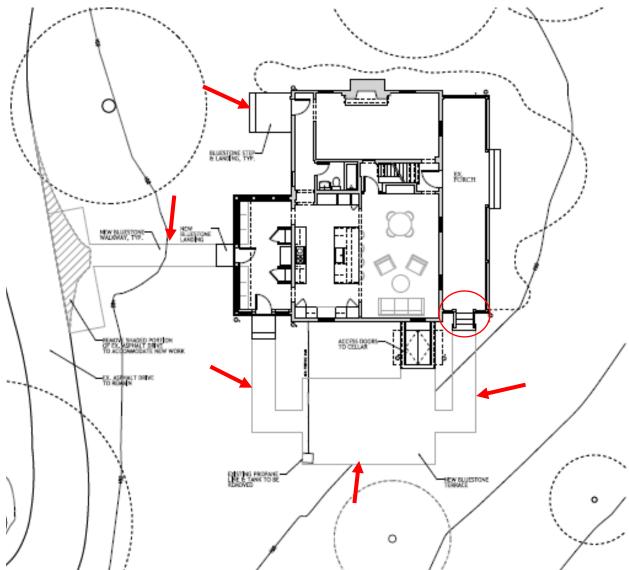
Revised site plan with red arrows showing the proposed bluestone walkways and terrace south of the house. The proposed new porch steps on the south end of the front porch are circled in red.
